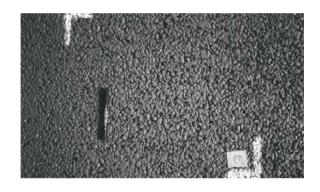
Surface condition of solar heatblocking pavement after torsion test (type A)
